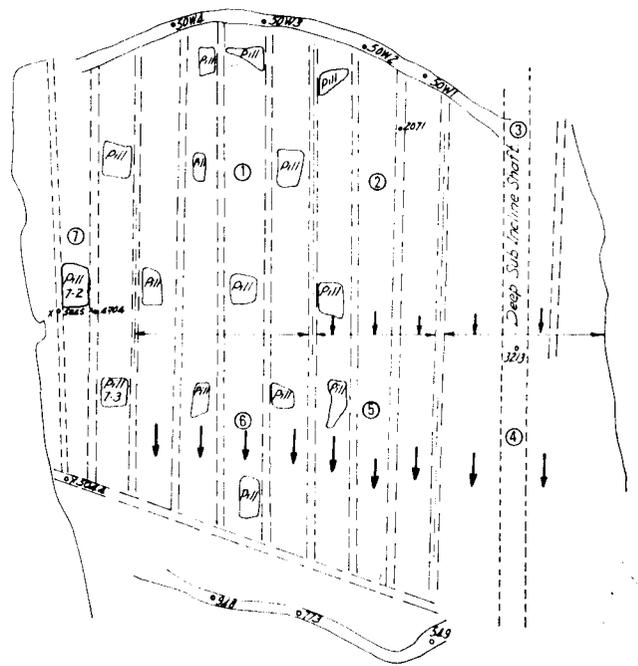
Layout of a stope supported on pillars, indicating the sequence of pillar extraction and the direction of retreat
